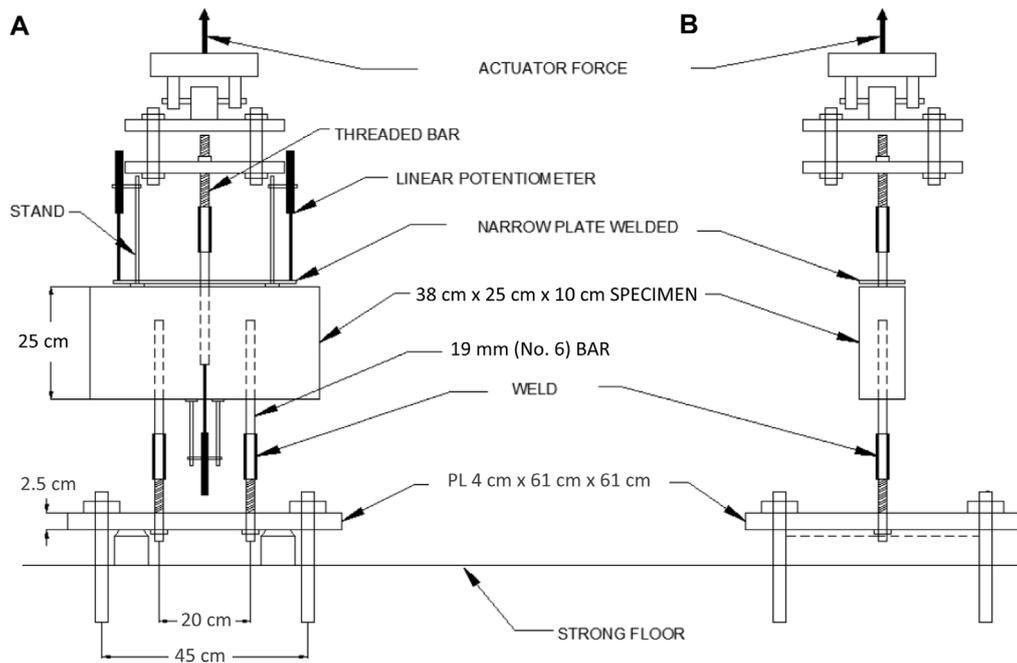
Specimen (A) front view, and (B) side view (1 cm = 0.394 in.).
